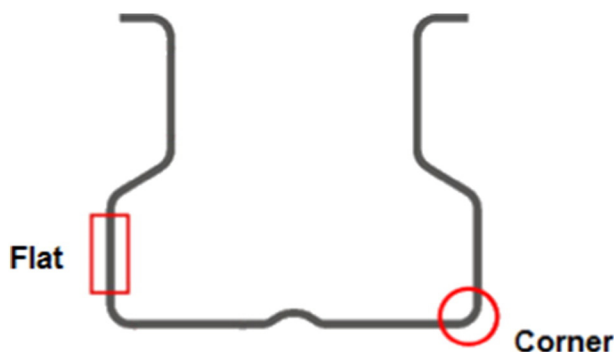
Flat and corner zones where tensile coupons were cut out.
